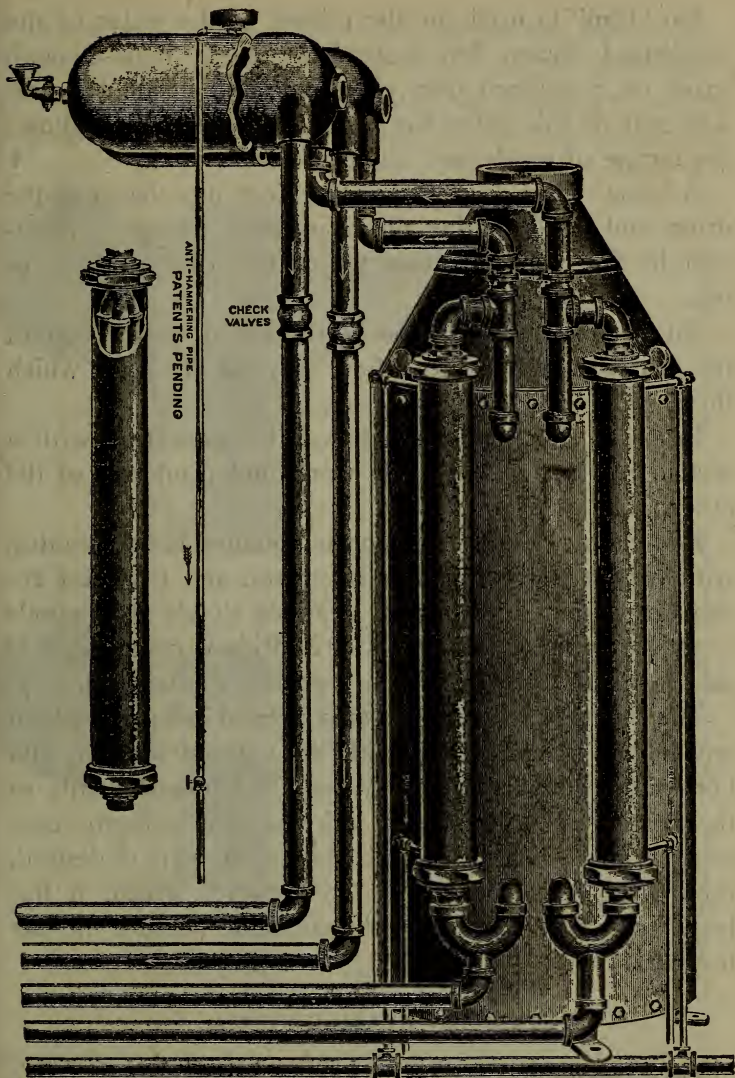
DETAILS OF IMPROVED BAKER STEAM ATTACHMENT.
